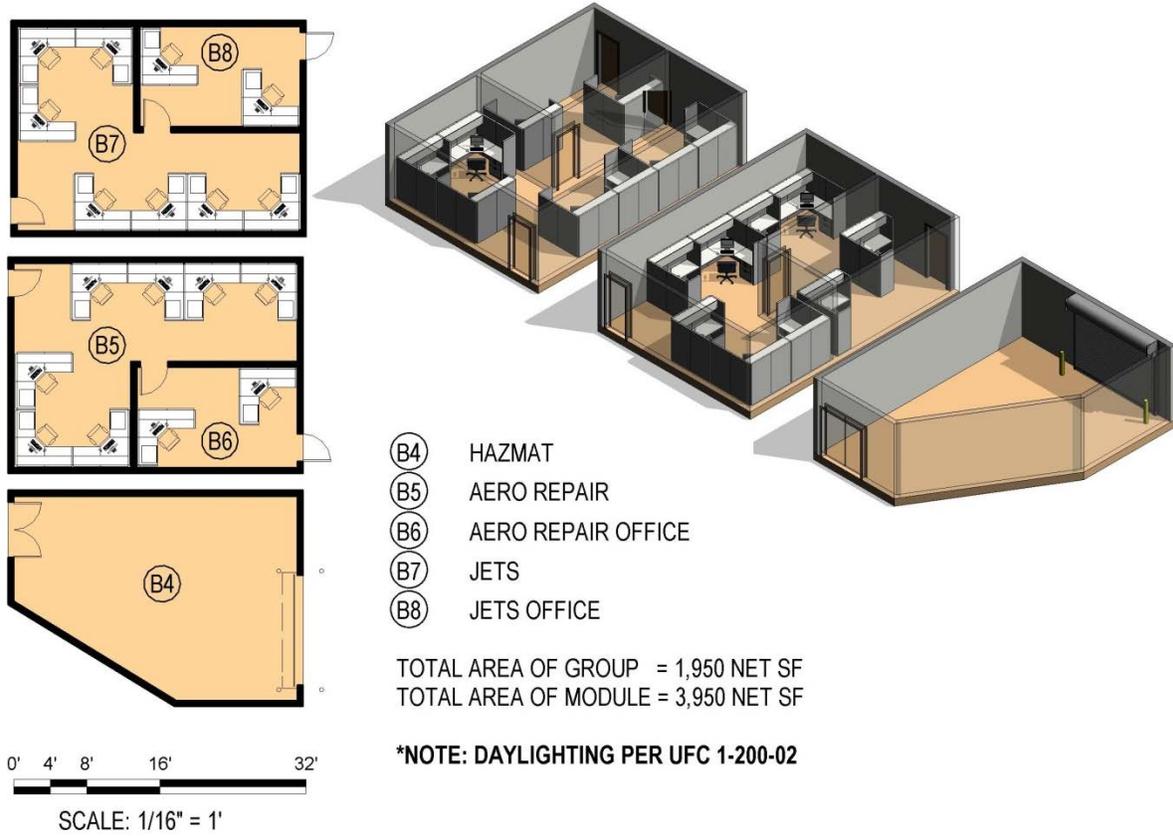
Module B Floor Plan & Axonometric (1 of 2)
